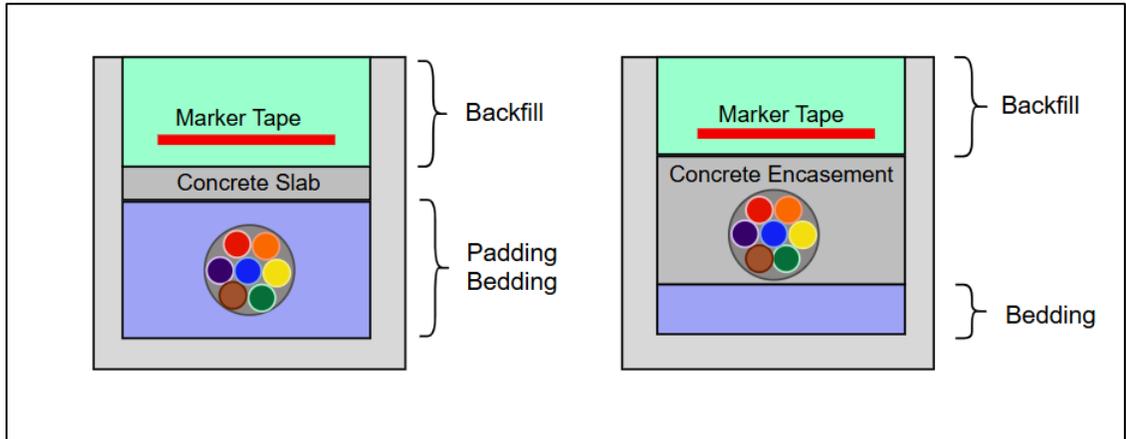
Duct Installation: Concrete Slab and Encased Configurations
